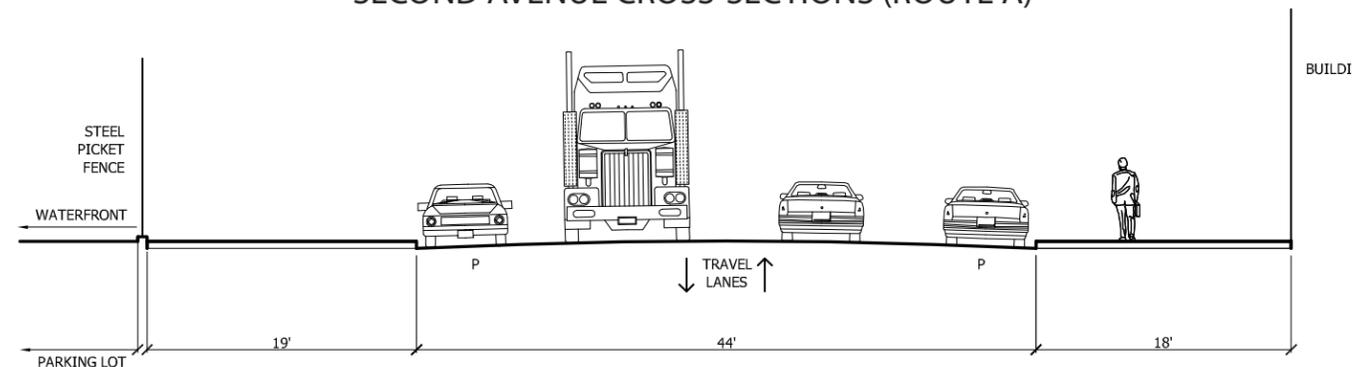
Existing configuration on Second Avenue between 58th Street and Wakeman Place
